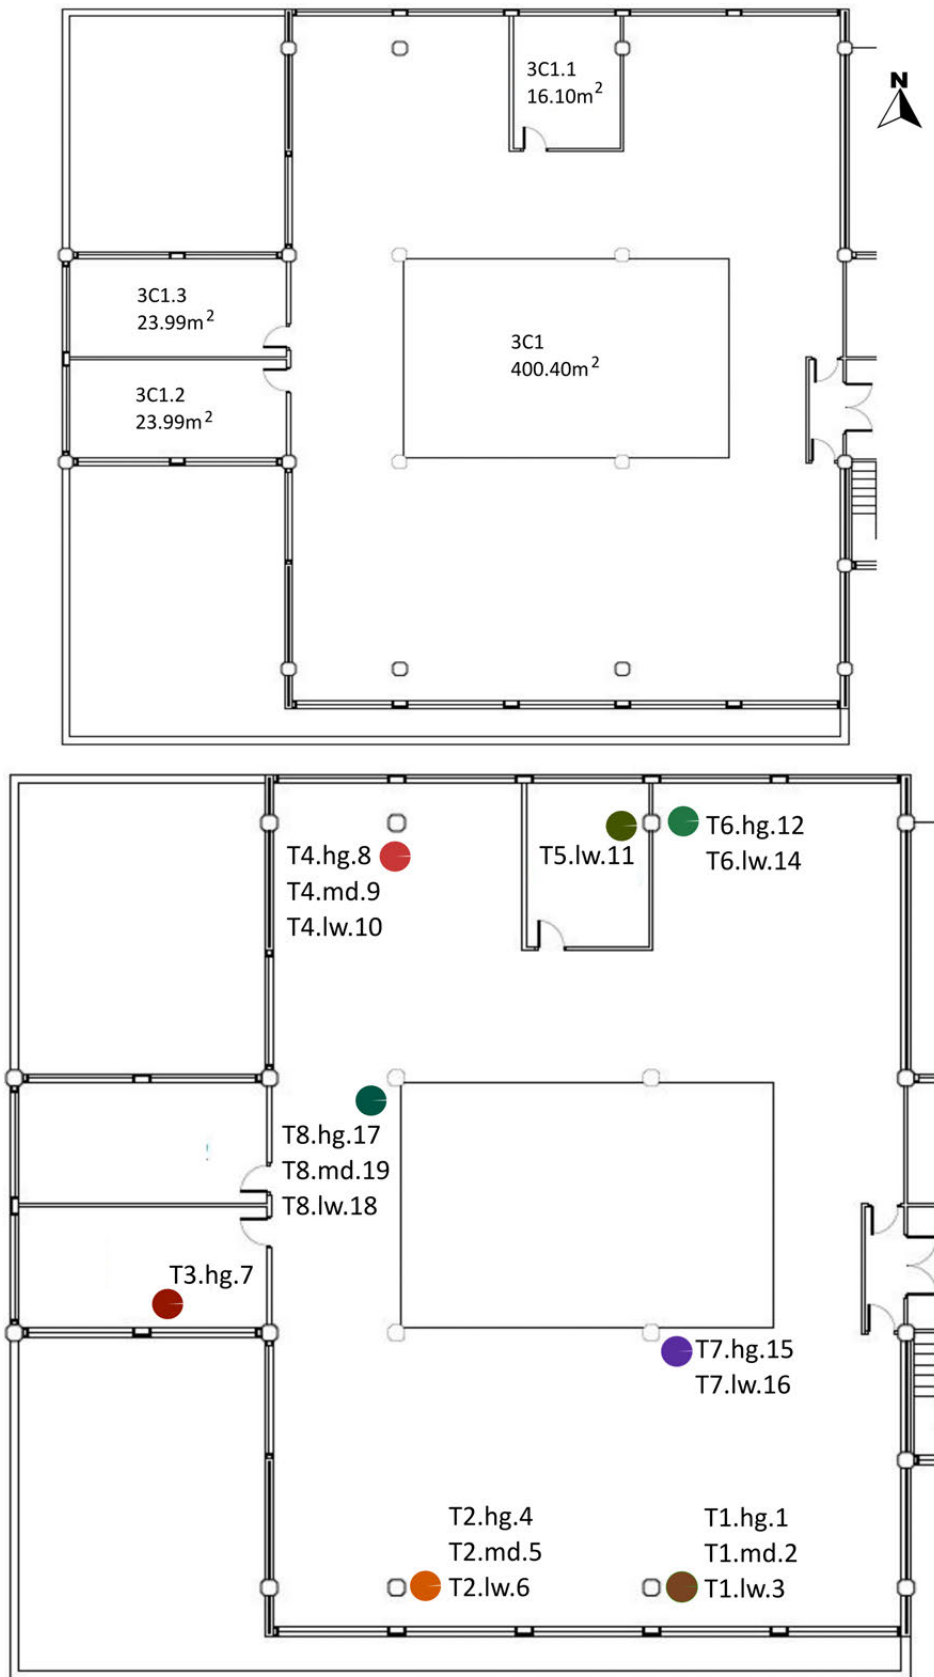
OT4 sensor layout, located in F3. Based on A2PBEER project's architecture plans [139].
